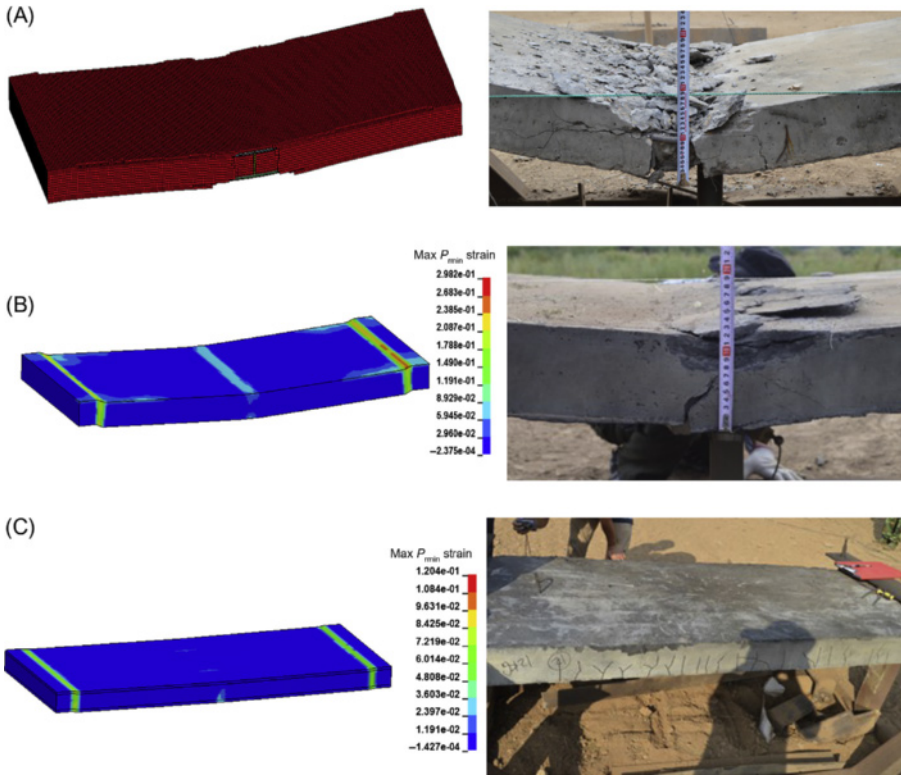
Numerical modeling results of slabs after blast test: (A) NSC slab damage, (B) SFRC slab damage, and (C) SWM-SF slab damage.
